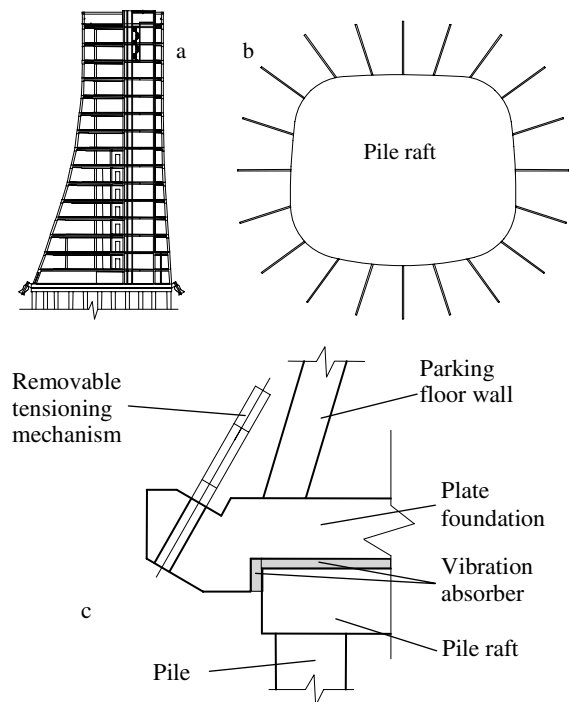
Constructive scheme of anti-seismic arrangements for building: a – constructive section of the building; b – anchor disposition plan; c – foundations' construction.
